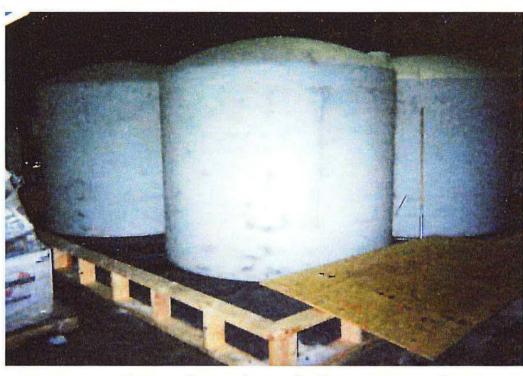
Looking southwest, picture of spill containment wall construction surrounding the four 2,500-gallon storage tanks. The 20-mil polyethylene liner is visible on the floor.
